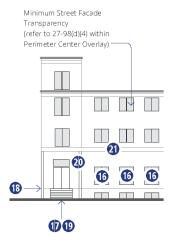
Civic Building: Street Facade Design Requirements
